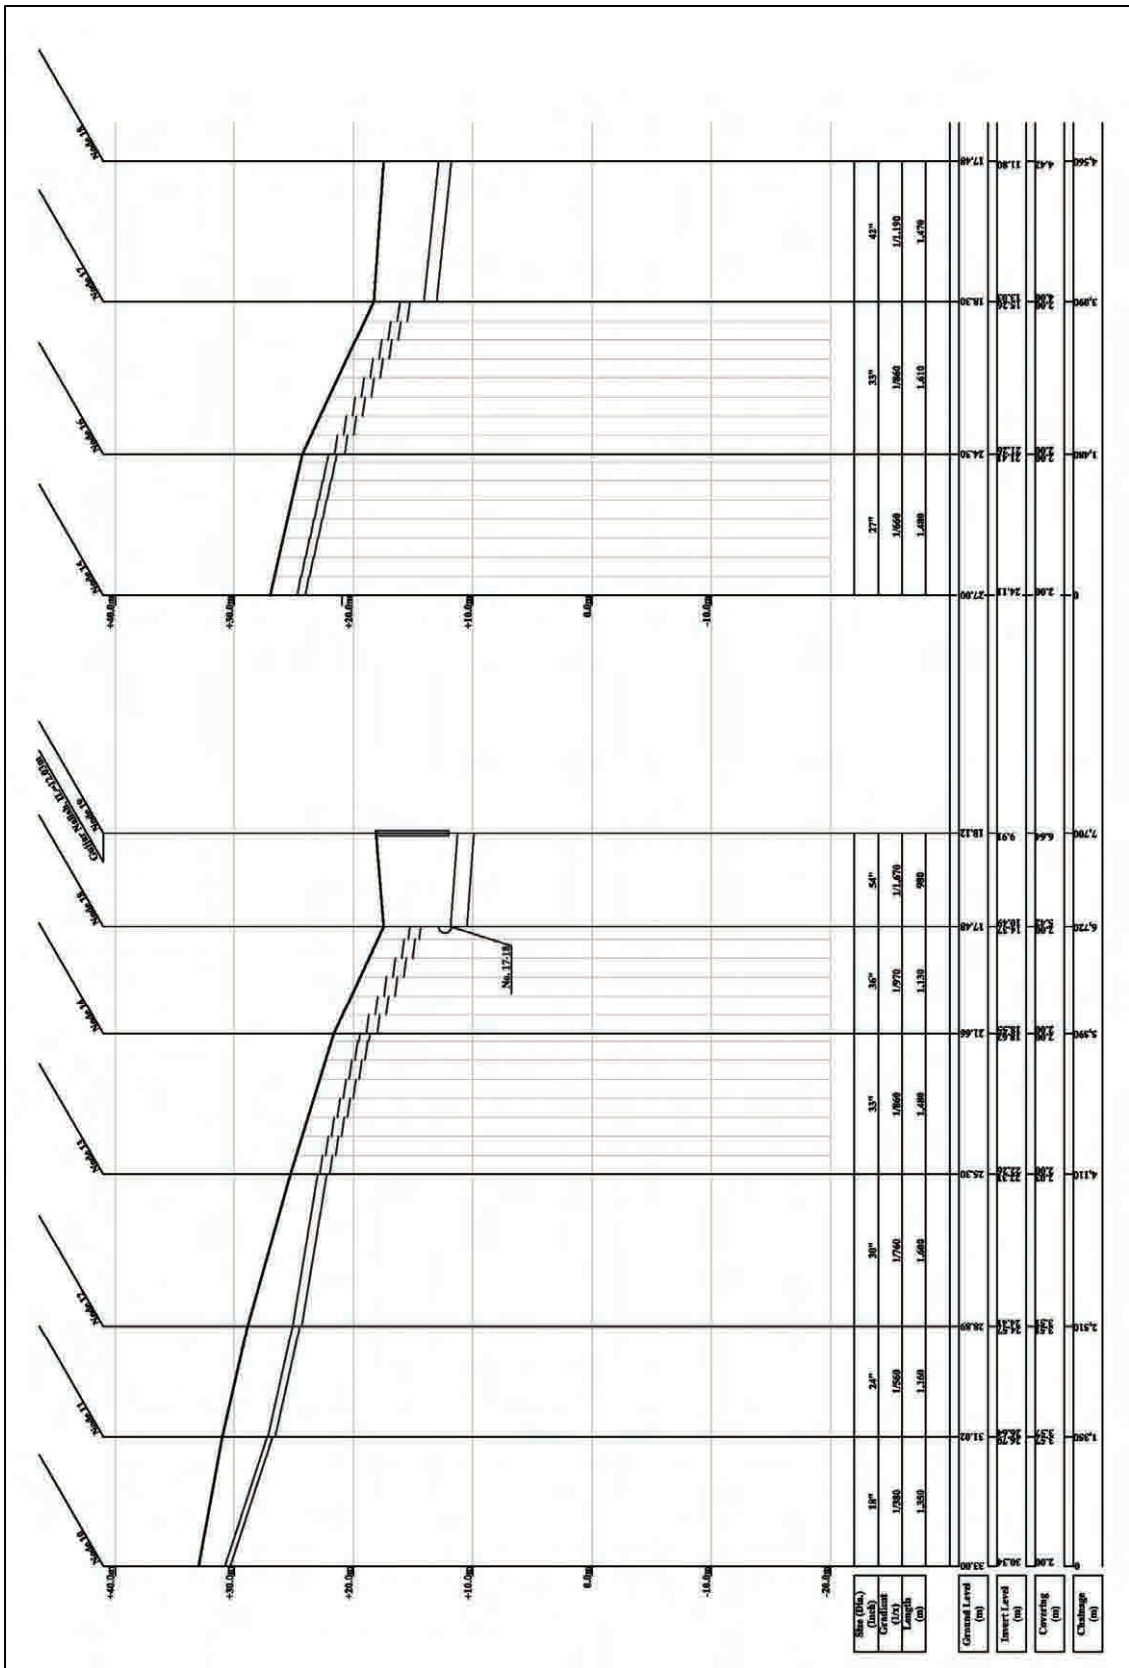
Longitudinal Section of Trunk Sewer and Sub-main Sewer (2/4)
